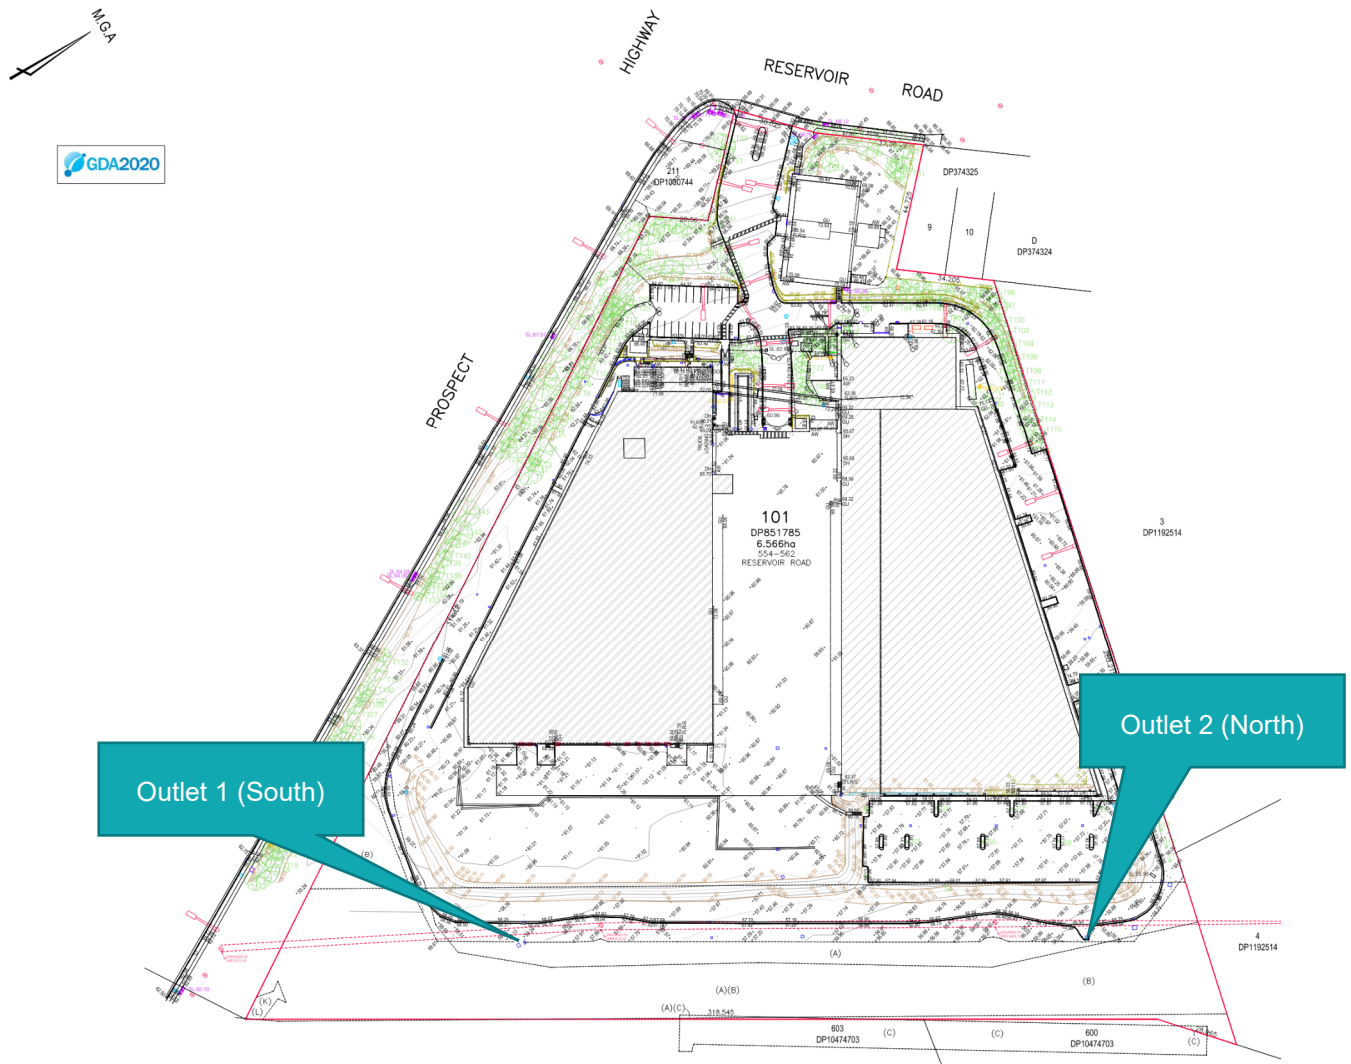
Survey plan (Source: LandPartners, 2020)
